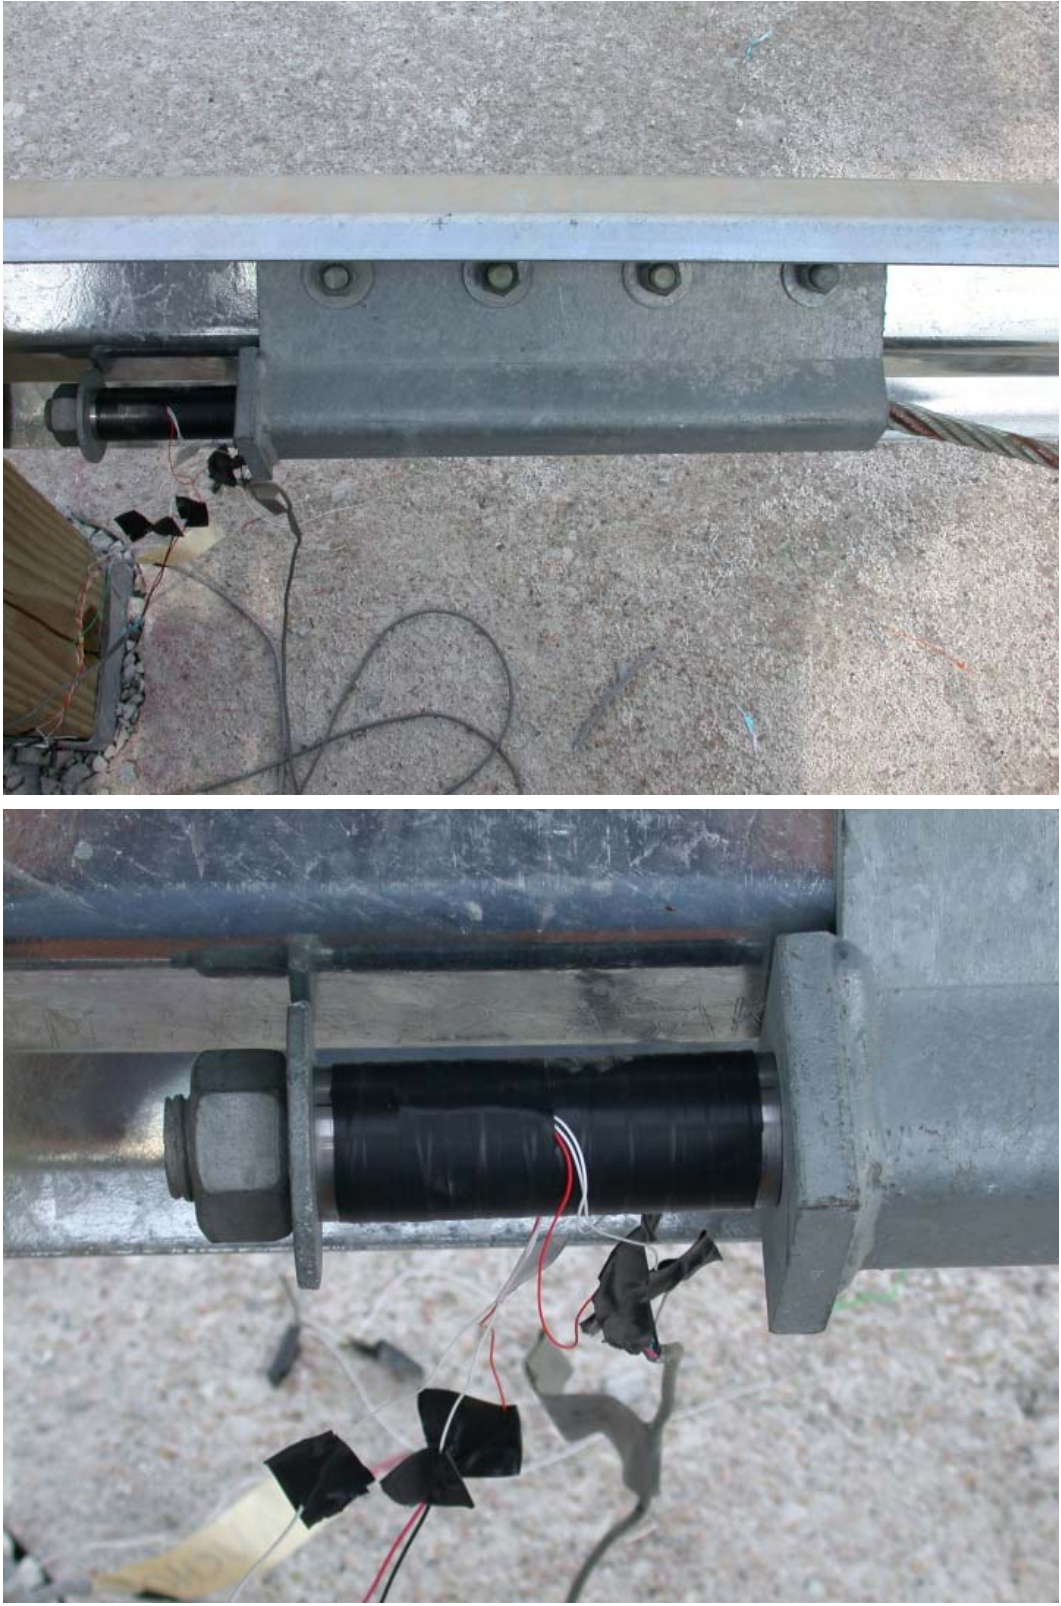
Attachment of Load Cell to Guardrail Anchor Cable
